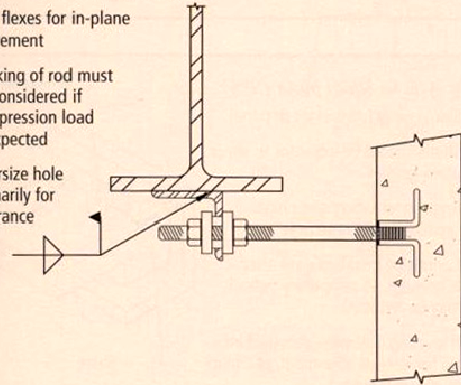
Welded tieback (WTB2).
